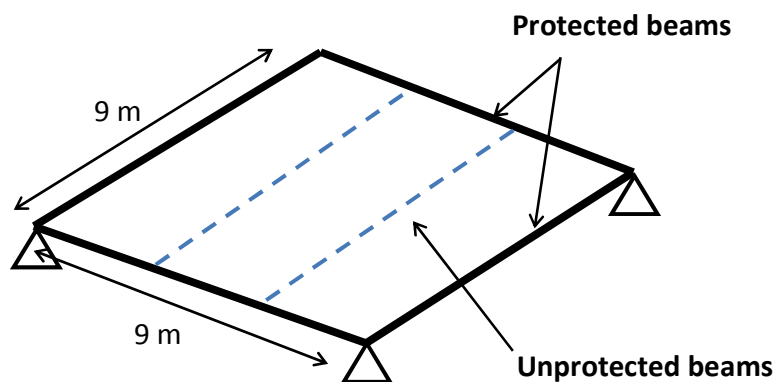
9 m × 9 m isolated slab panel with protected and unprotected steel beams (Gu *et al.*, 2013)
